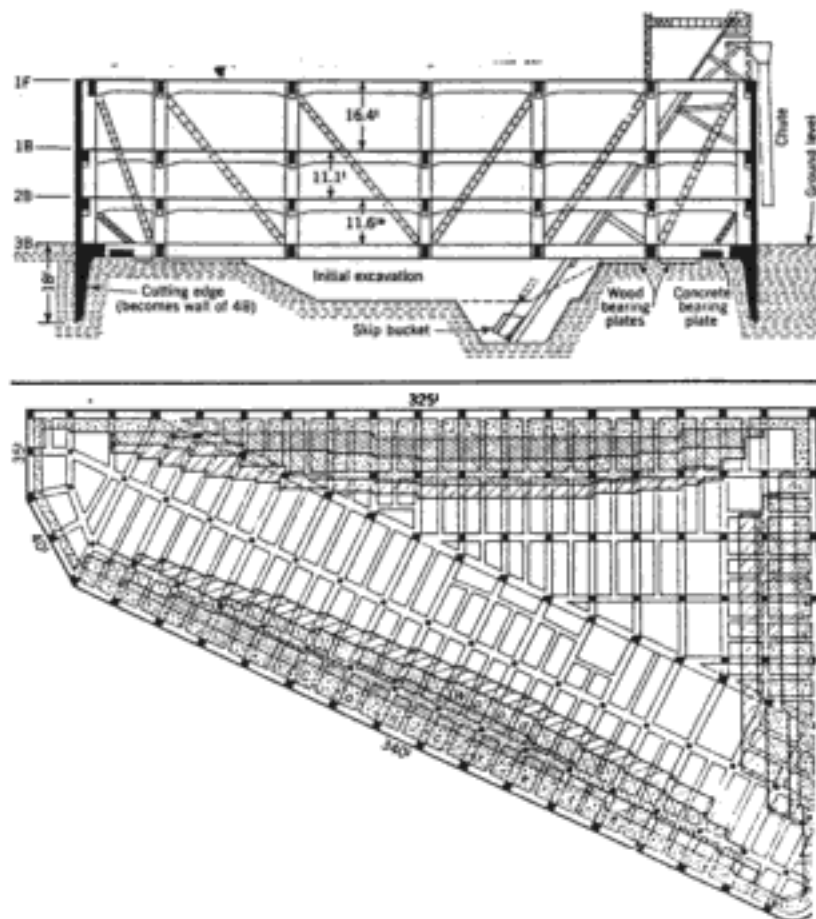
Land caisson for the Nikkatsu building, Tokyo. Bearing plates shown in plan and section were used to control verticality and plan position of the caisson during sinking (Mason²⁷)
